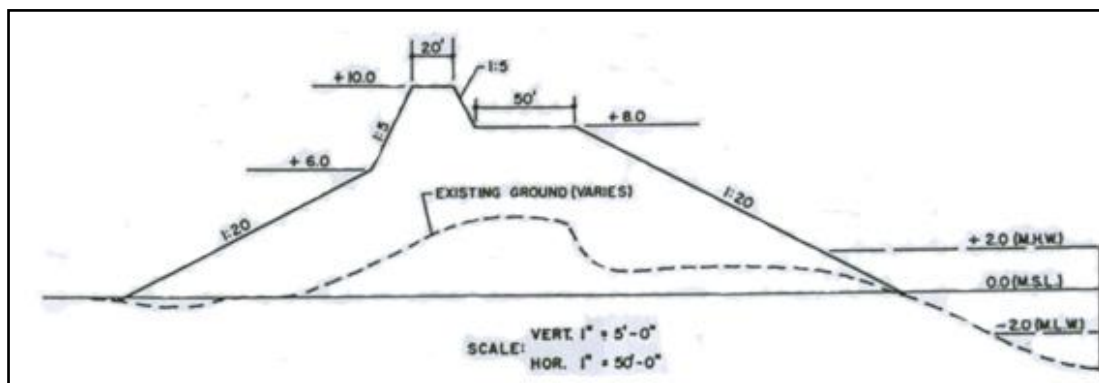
USACE Plan for Renourishment. Plan for renourishing the beach and the dune system of damaged beach systems after the 1962 Northeaster (Podufaly, 1962). Note: 1 foot = 0.3048 meters.
